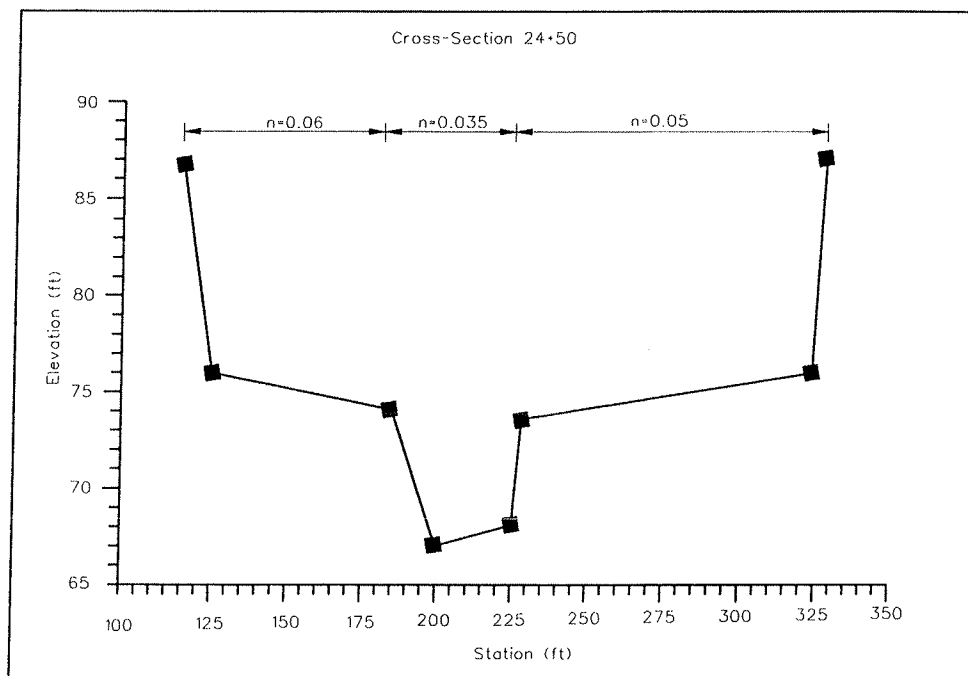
A-4. Cross Section at Station 24+50 (farthest upstream)
